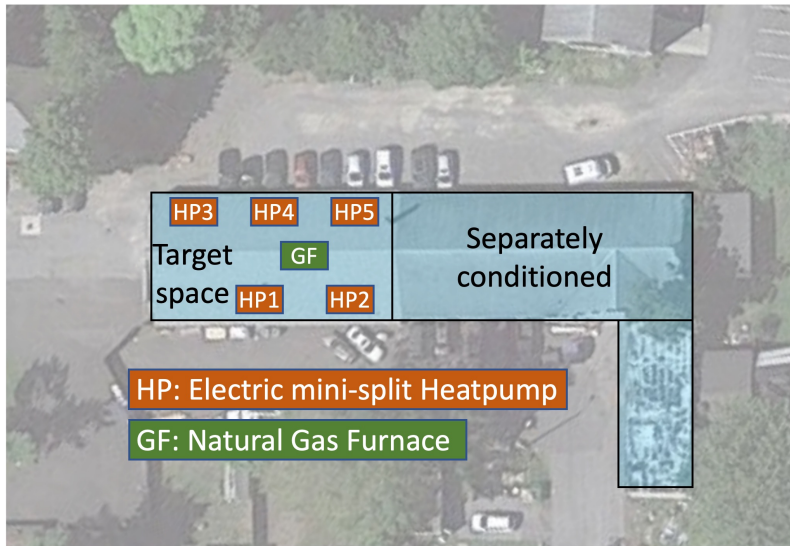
Demonstration site plan: workspaces and HVAC system zones
